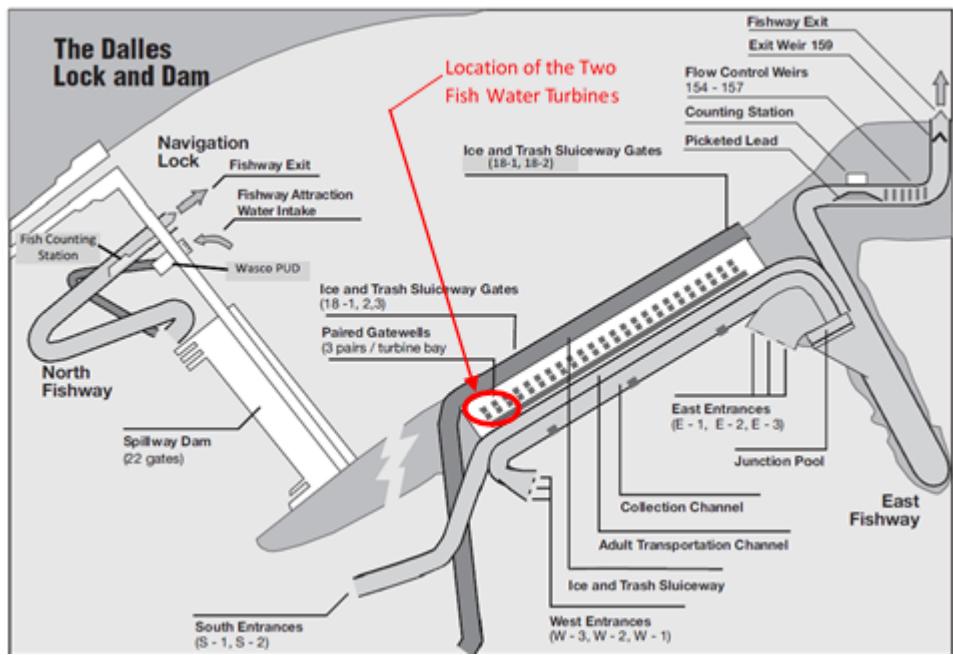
Spillway, Fishways, Powerhouse and Other Structures at The Dalles Dam
